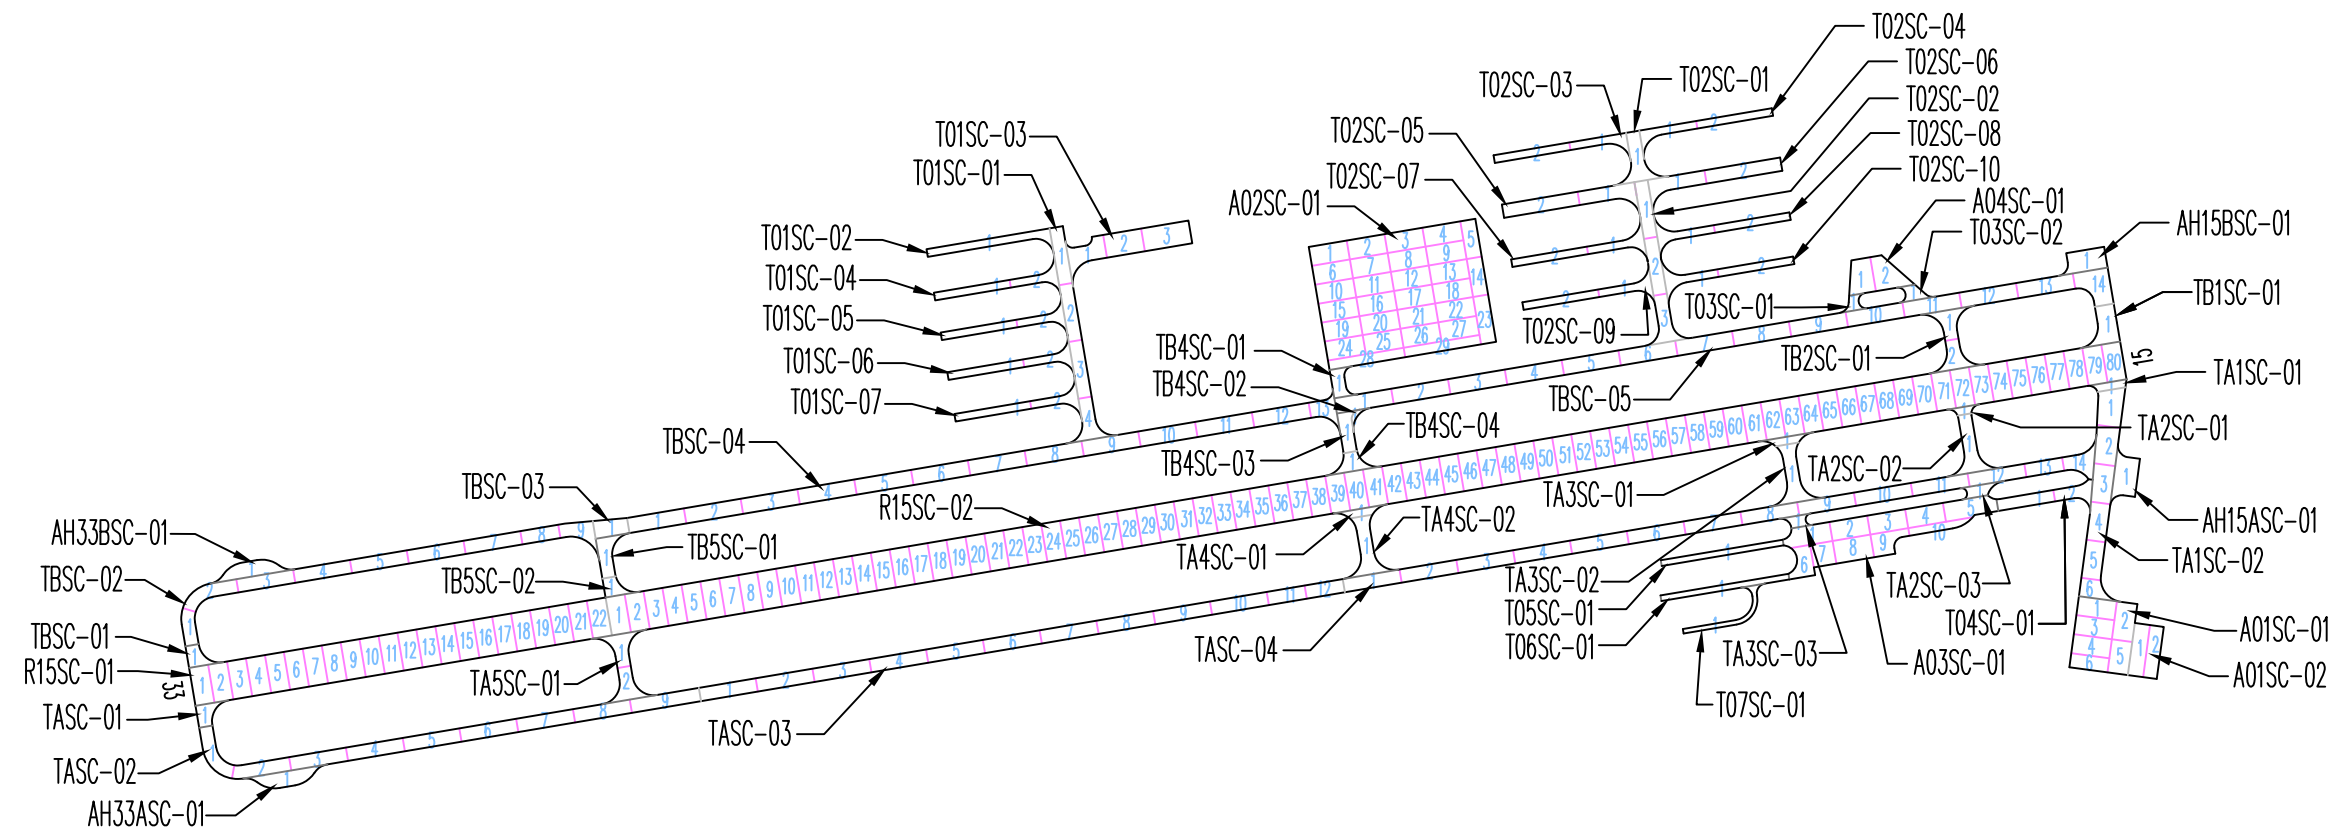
Pavement Branch, Section and Sample Unit Layout.
